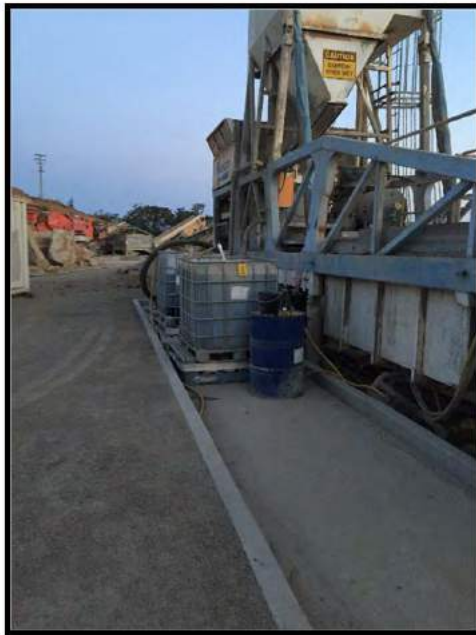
Mobile Cement Batching Plant. Close up of the Concrete Walled Area to catch any spillage. This structure is also the top of the in-ground spillage containment tank that is regularly pumped out, so any spillage will be contained on site with in the tank.
